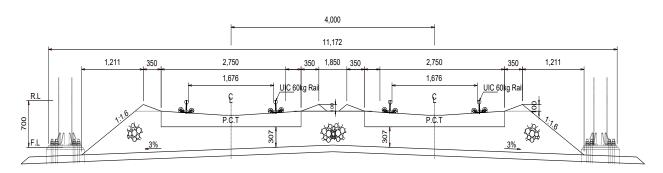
Cross-section of Ballasted Double Track on Earth Work
